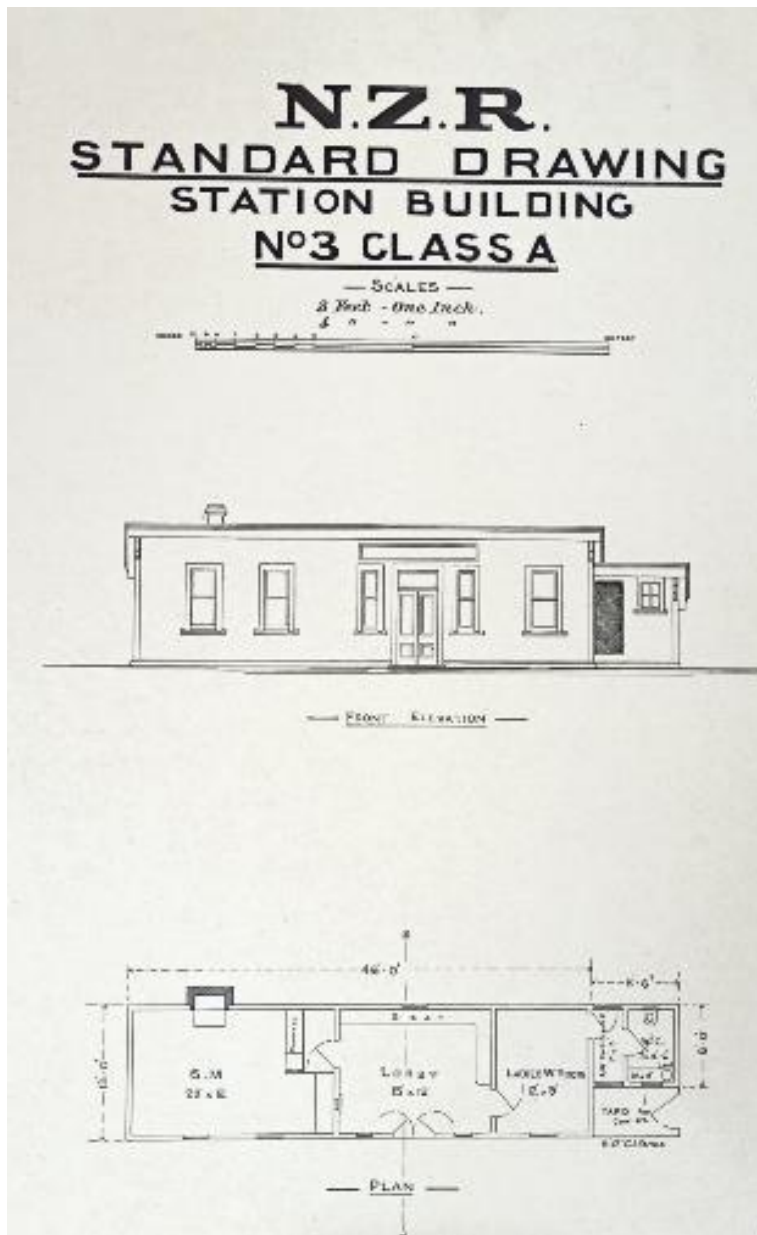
New Zealand Railways Standard Drawing Station Building No3 Class A, 1914 NZR Engineering Notebook, Provided by Alex Pirie, WSP.
